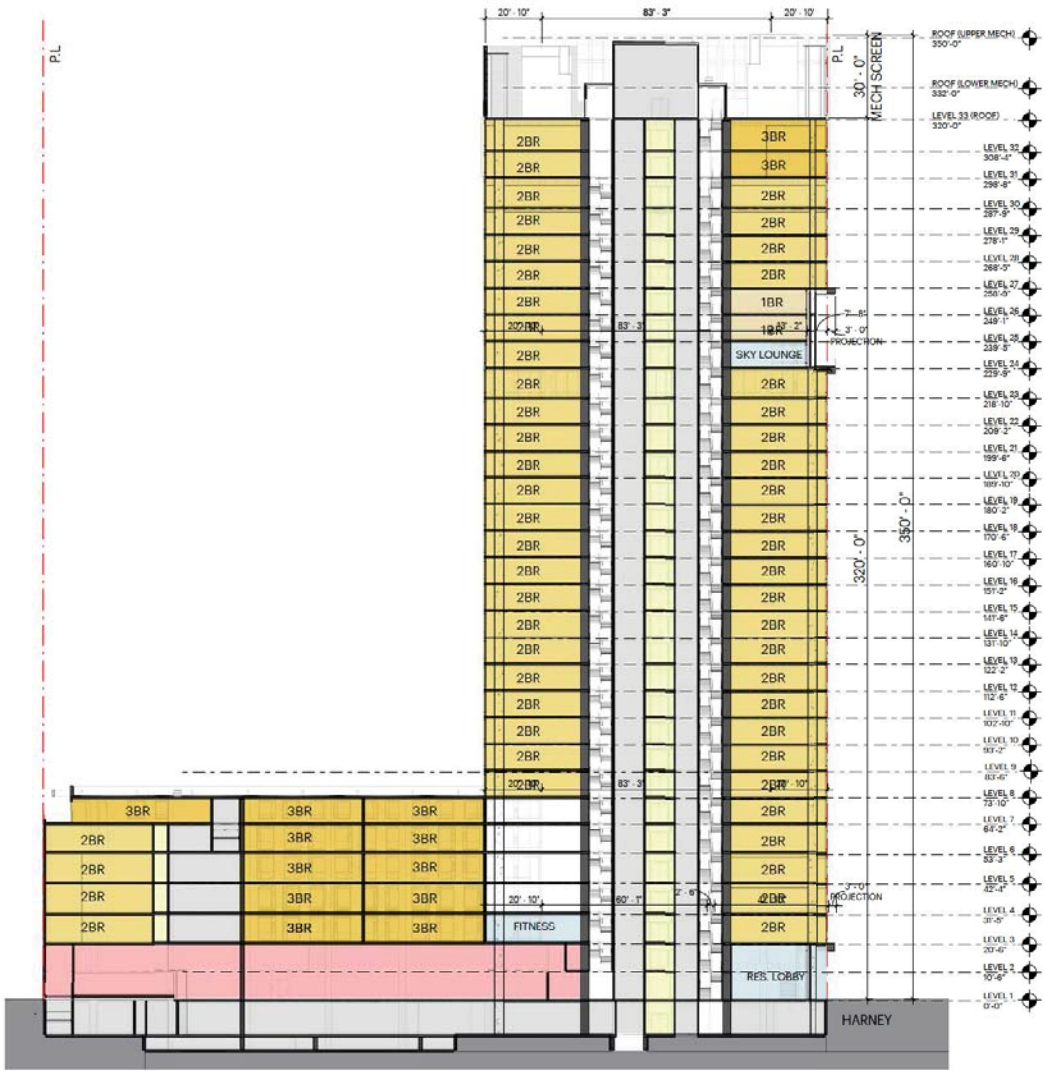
C - Building Sections Alice Griffith (CP-01) Section B-B
